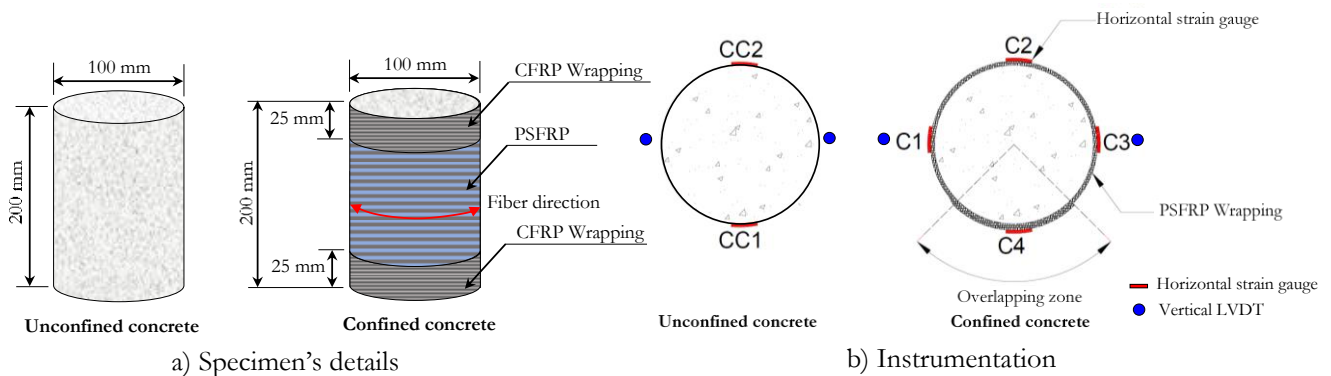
Details of concrete cylinder specimens and instrumentation.
